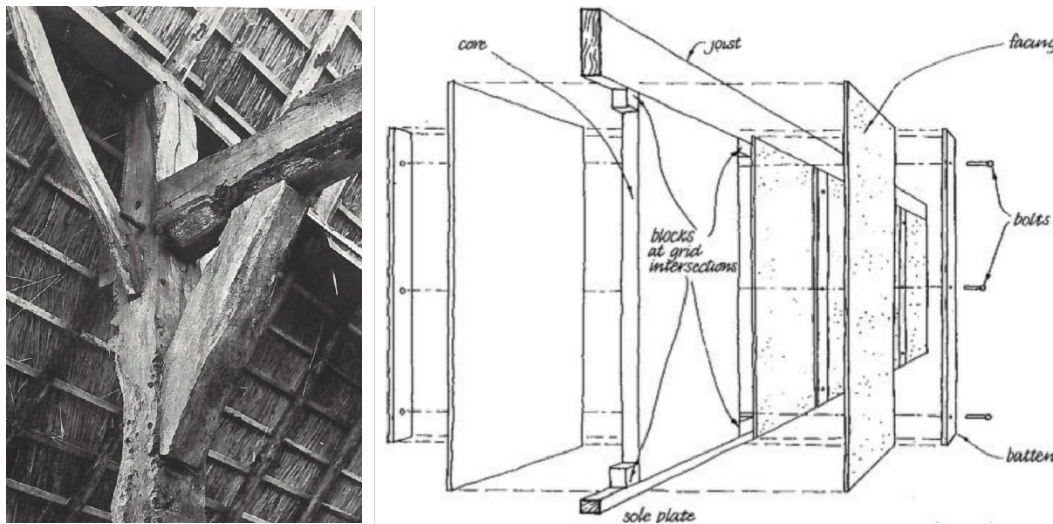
(left). Anchor beam truss connection. Reprinted from (Jans et al., 1980, p. 57).
